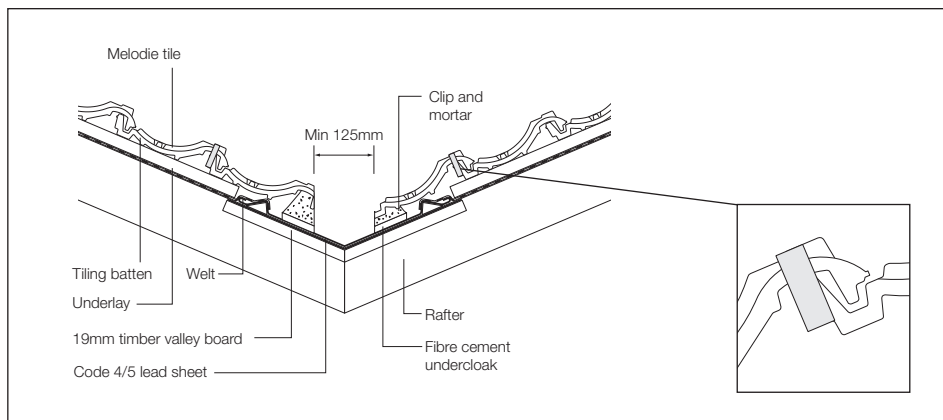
Section through bedded, metal lined valley (inset shows fixing clip for small cut pieces)
